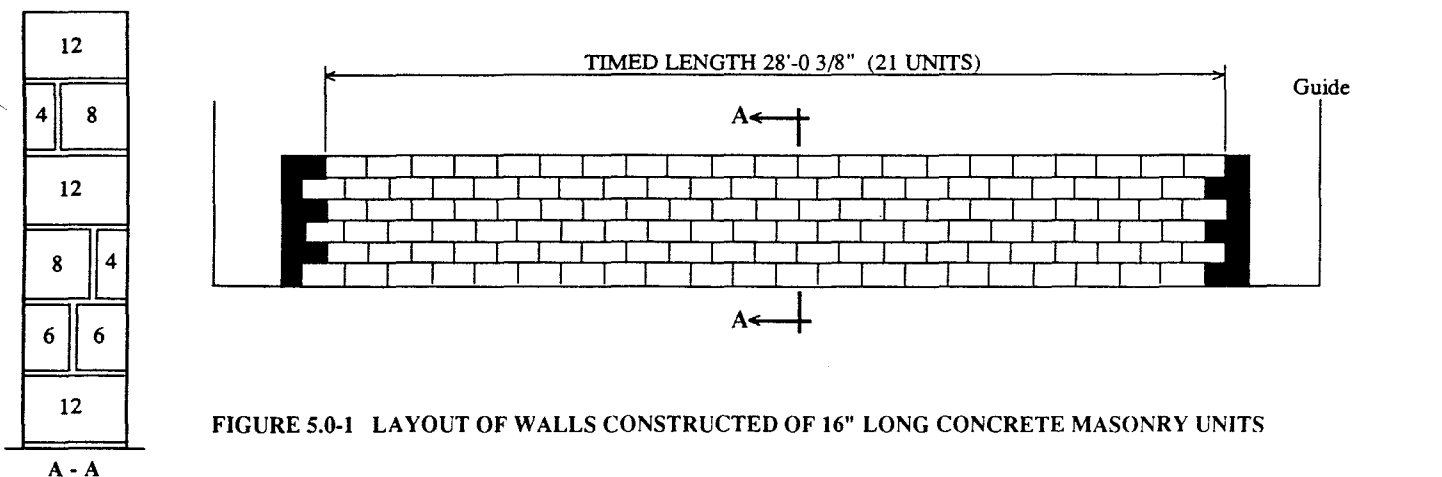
LAYOUT OF WALLS CONSTRUCTED OF 16" LONG CONCRETE MASONRY UNITS
